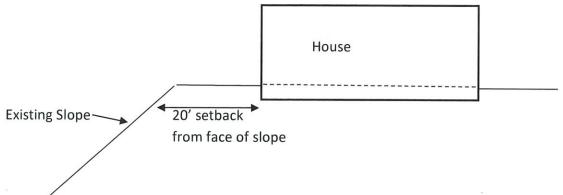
Cross-Section Through Property, Showing Setback from Face of Slope
